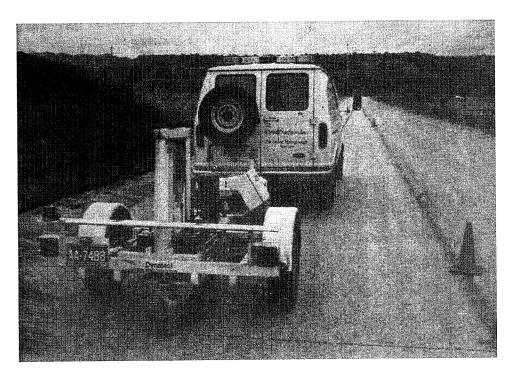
Falling weight deflectometer testing on Lane II at a joint
